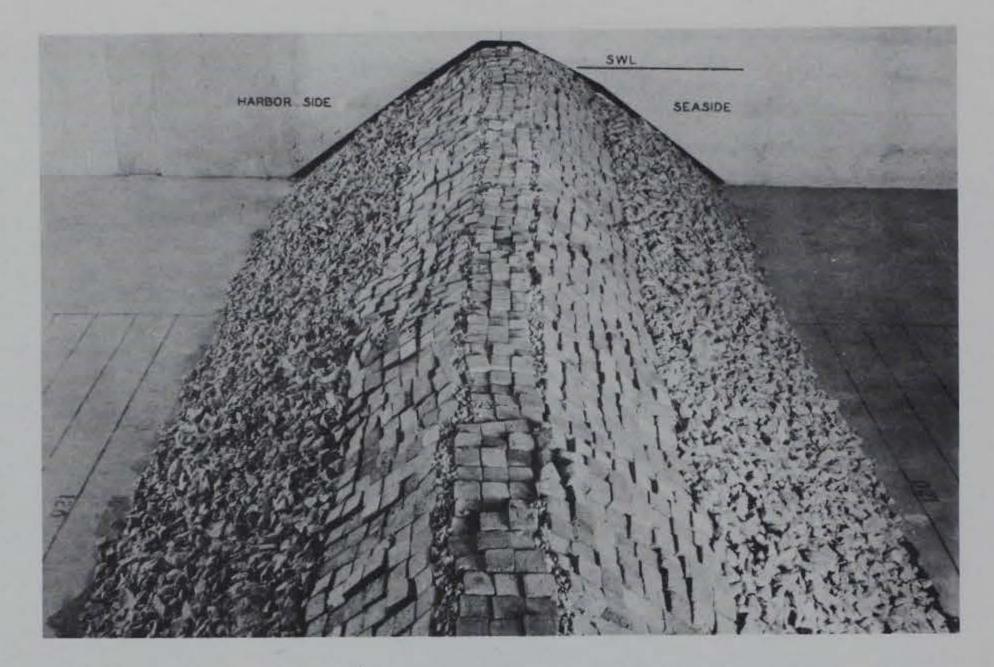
Test series 4, complete breakwater section before wave attack, class A stone of molded concrete blocks
